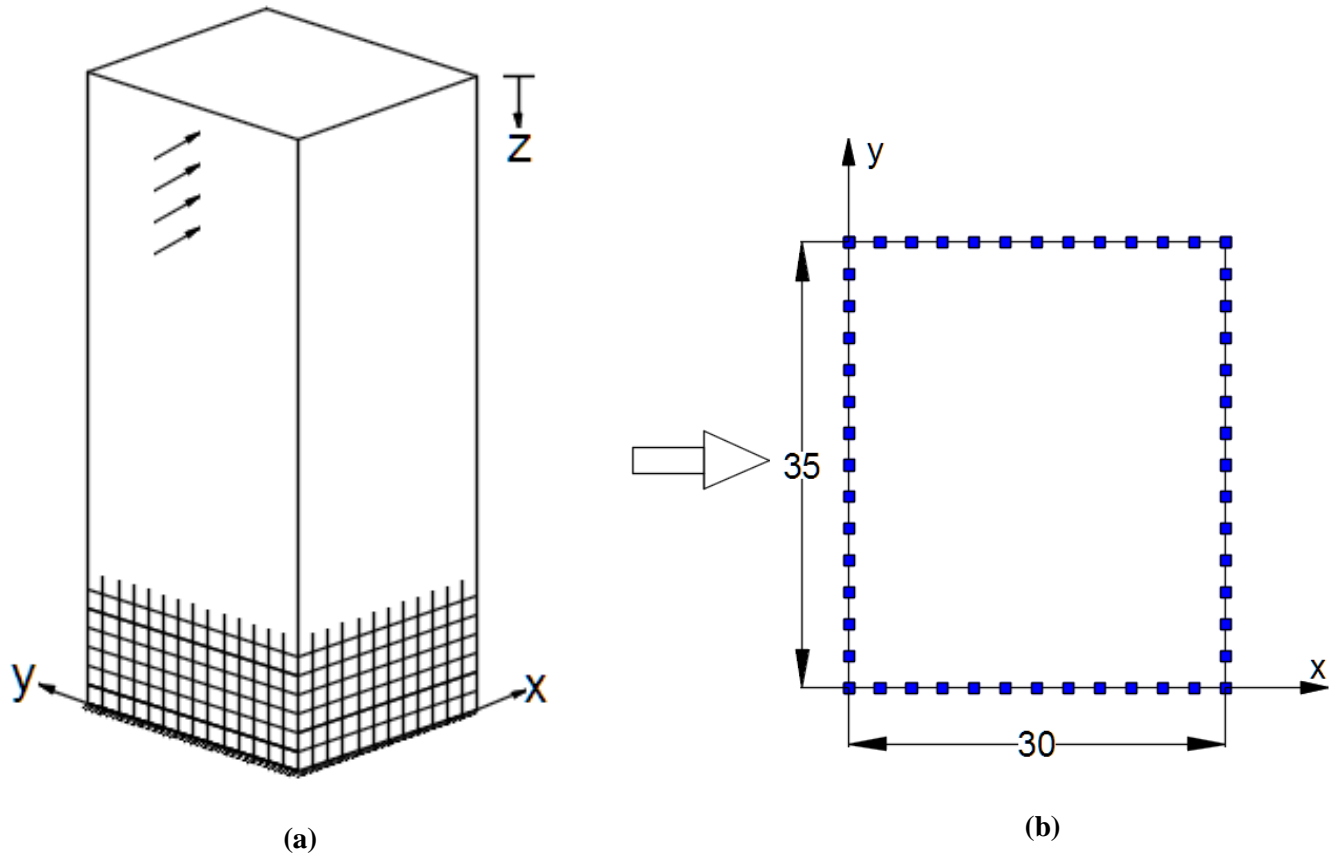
Geometry of framed-tube structure: (a) 3D view. (b) Plan view.
